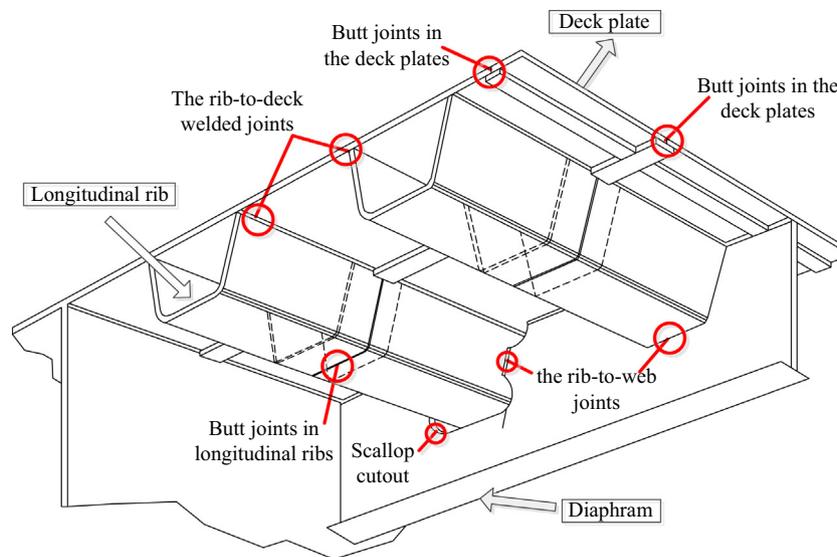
Typical welded details in an orthotropic steel deck.
